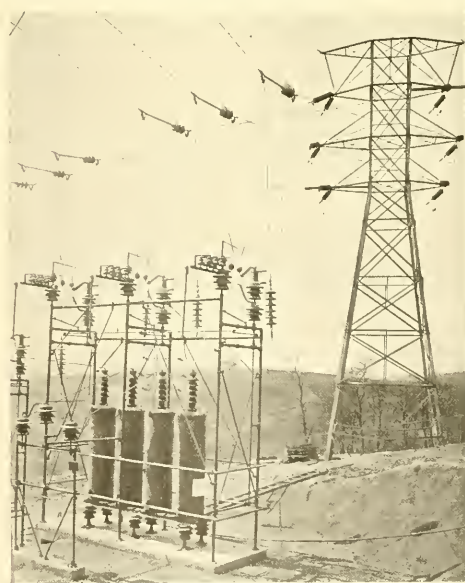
TYPICAL INSTALLATION OF LIGHTNING ARRESTERS AND STANDARD TRANSMISSION TOWER
